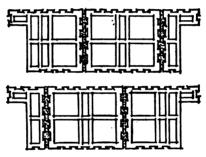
and 12.—Sections Through Wall Between Window Openings
